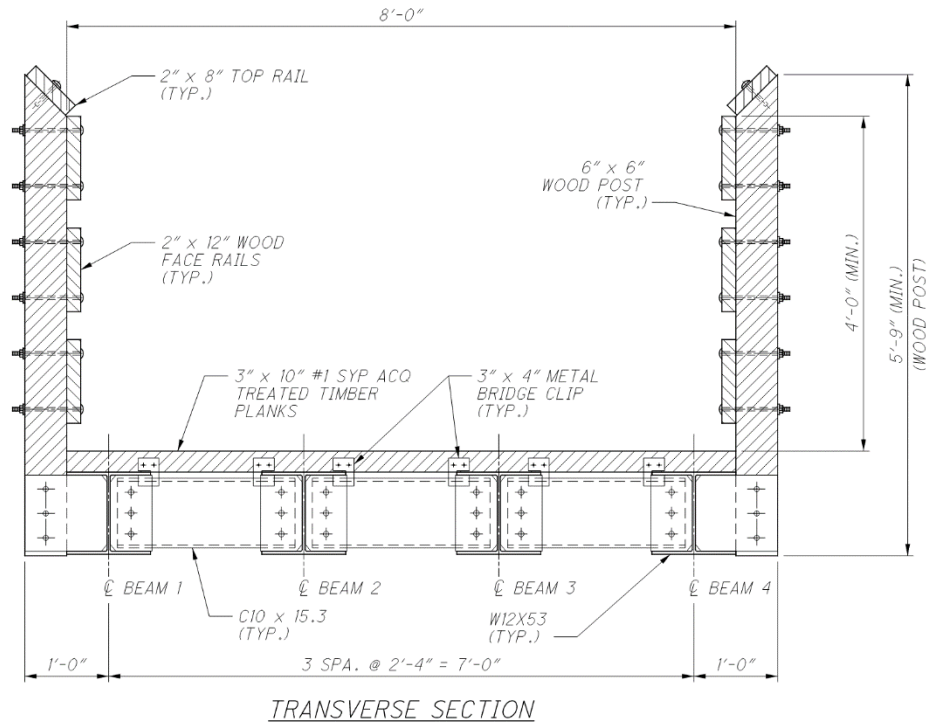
TRANSVERSE SECTION CONCEPT FOR PATHWAY BRIDGE
